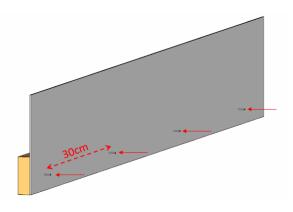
3D sketch showing the nailing of the roof tarpaulin to the wooden beam
